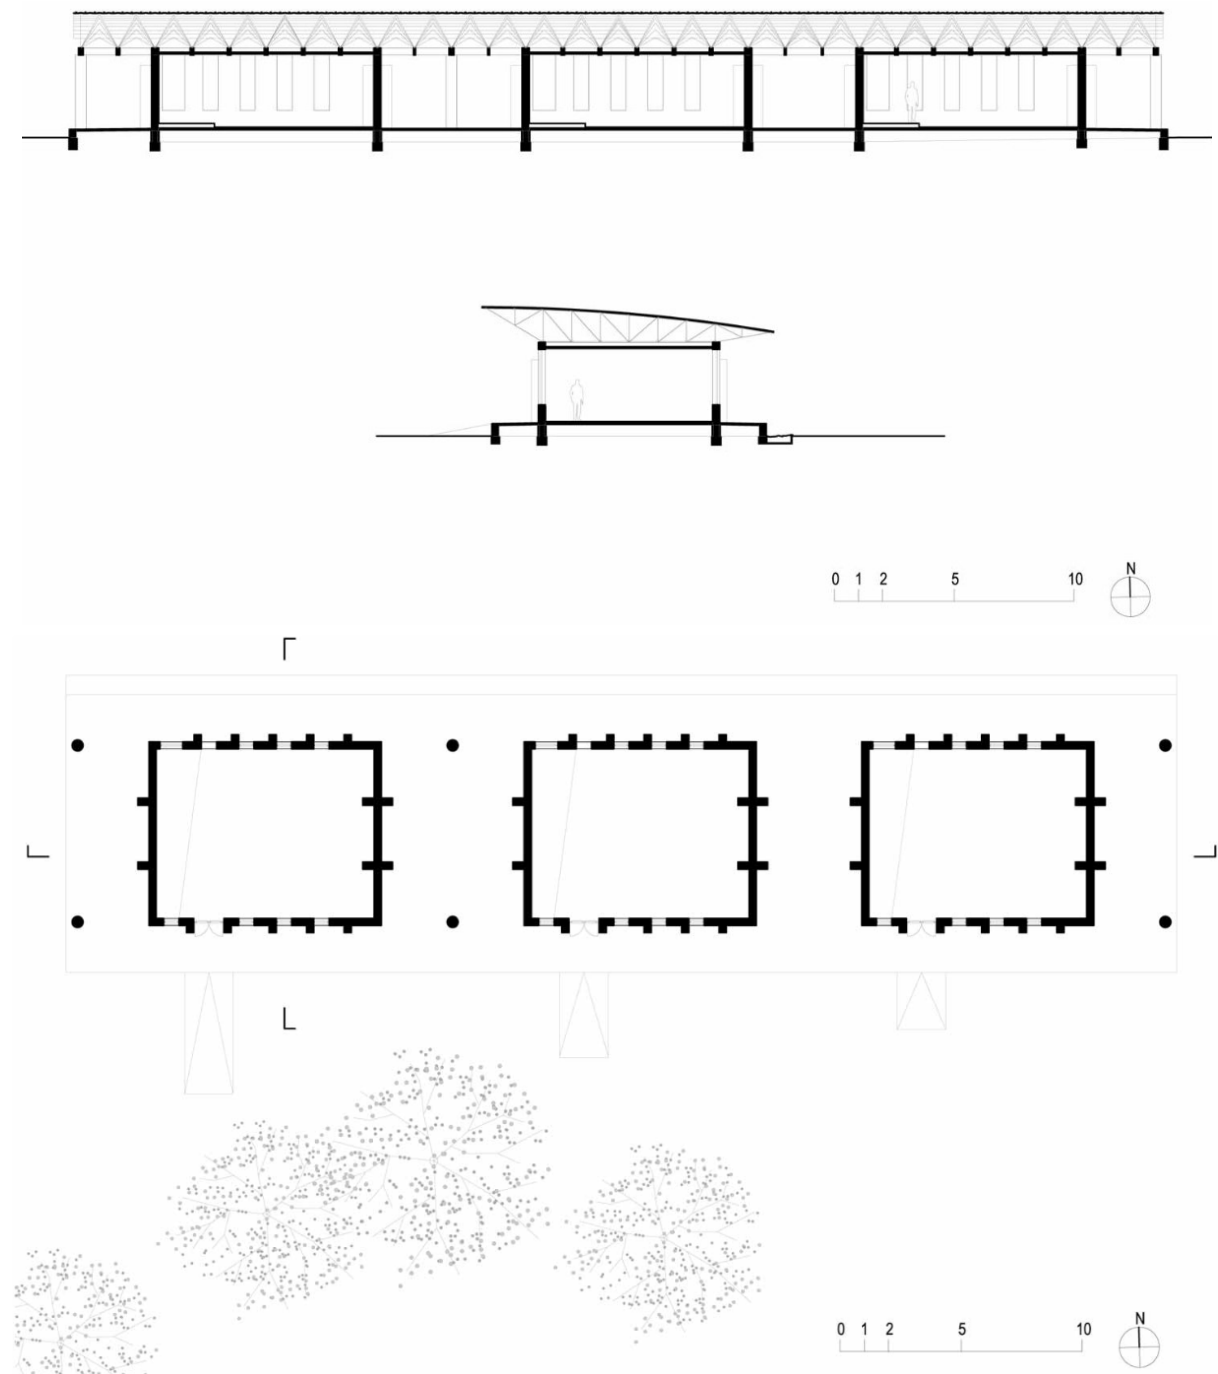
Additional documentation of the Gando Primary School. *Top:* longitudinal architectural section of the school building. *Centre:* Transversal architectural section of the school building. *Bottom:* Architectural ground plan of the school building. (Kéré Architecture)
